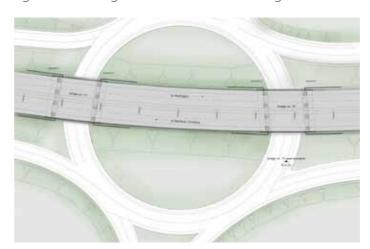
Bridges 13 & 14: SH58 Interchange plan
